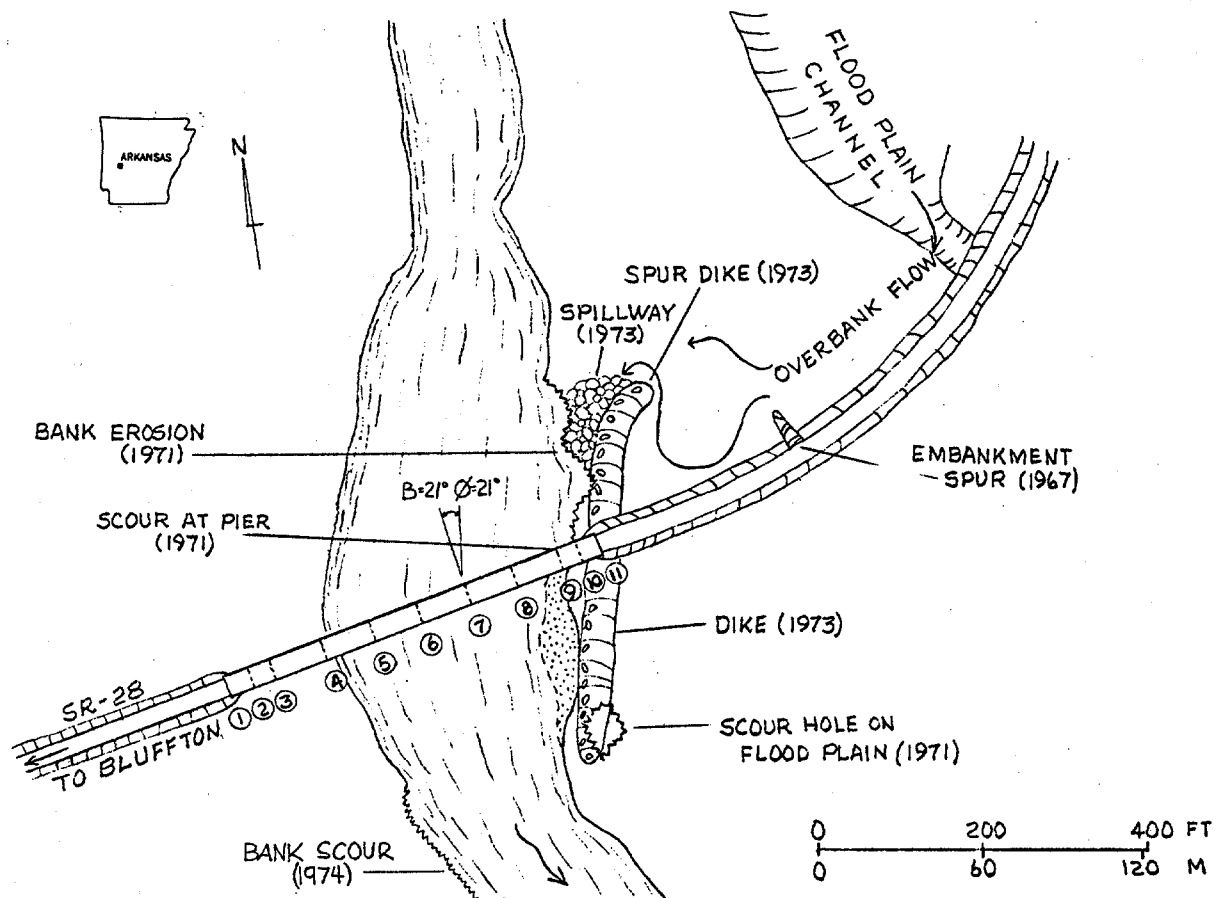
Plan of Fourche La Fave River at SR-28. (Based on aerial photograph dated 12-27-72.)
